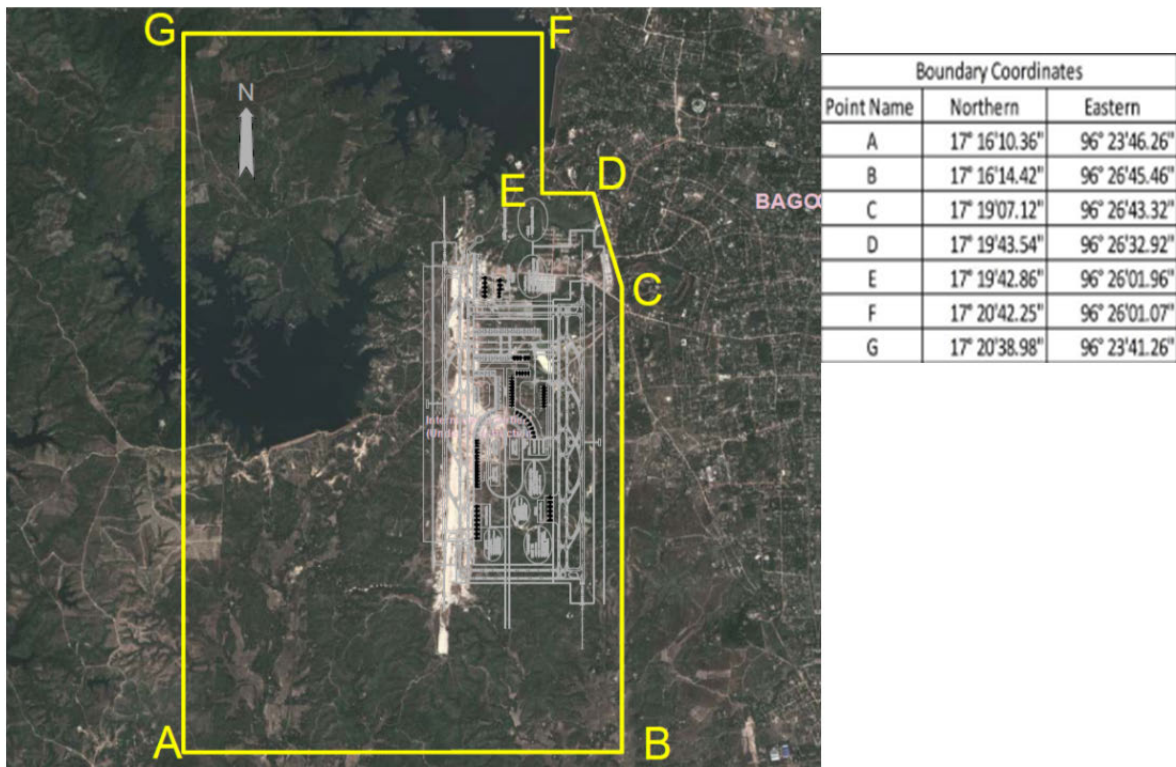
Proposed Site for Hanthawaddy International Airport
